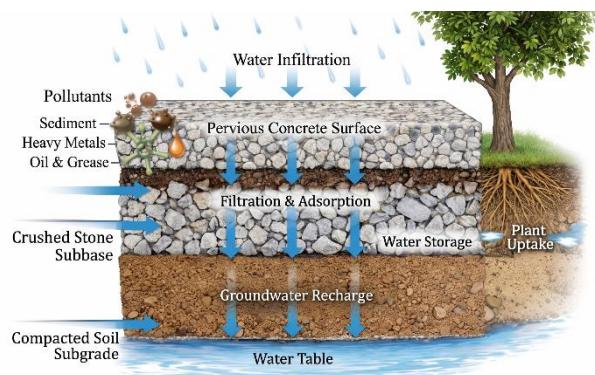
Schematic of pervious concrete pavement system (Surface layer-subbase-subgrade; infiltration path)
